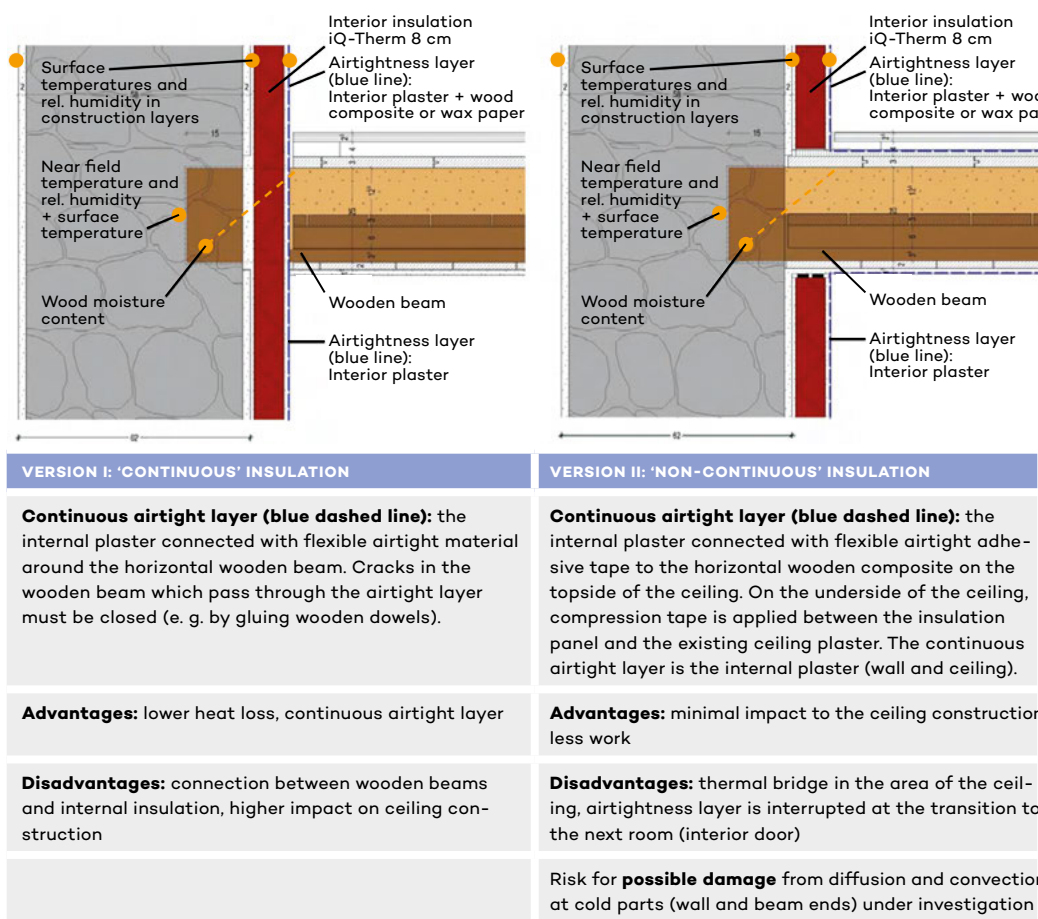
Insulation strategies in the joint of the wooden beam's with masonry wall (3ENCULT 2015, p.231)
